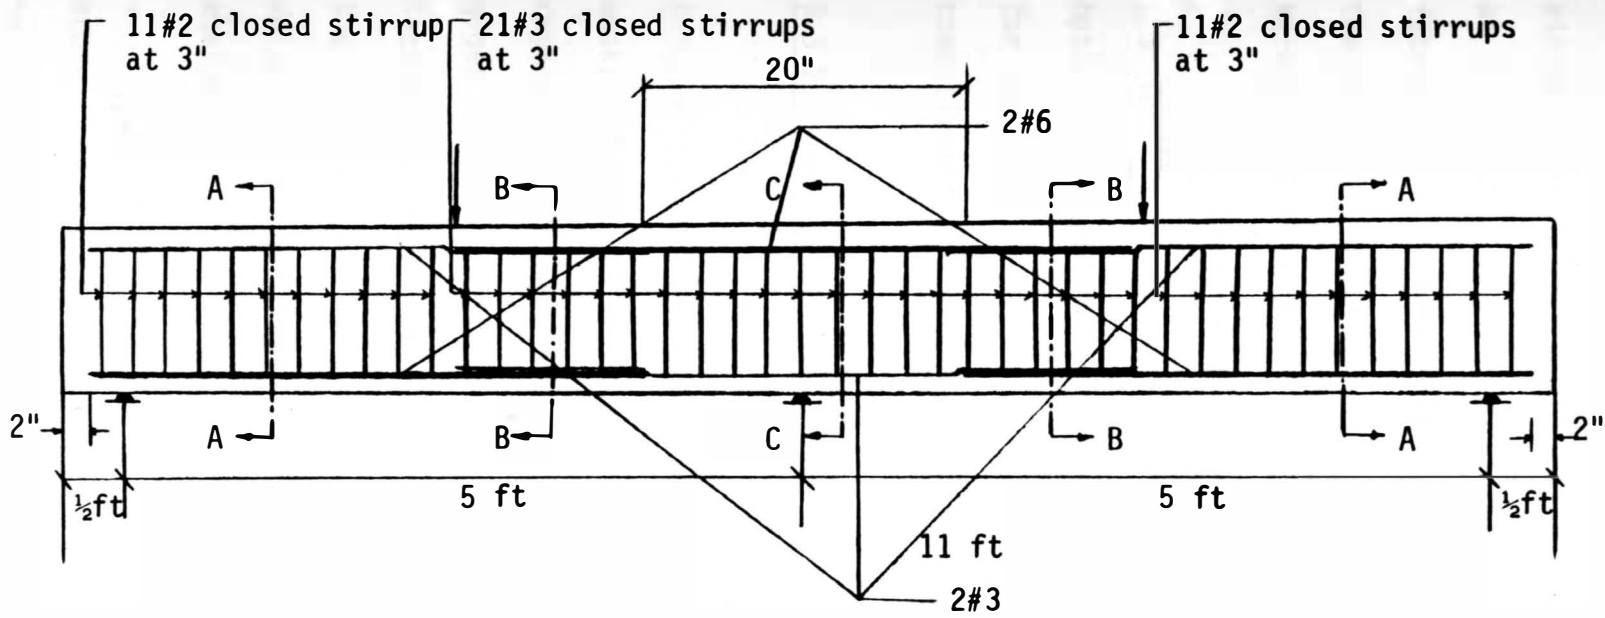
Reinforcement details of continuous beams 3, 6 and 9.
